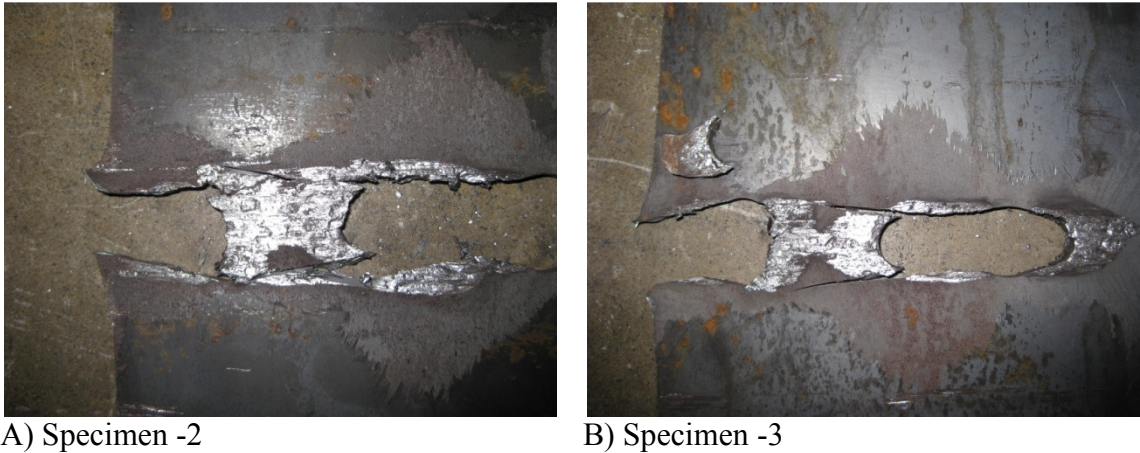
Specimen BRD2D5D tested under cyclic loading.
